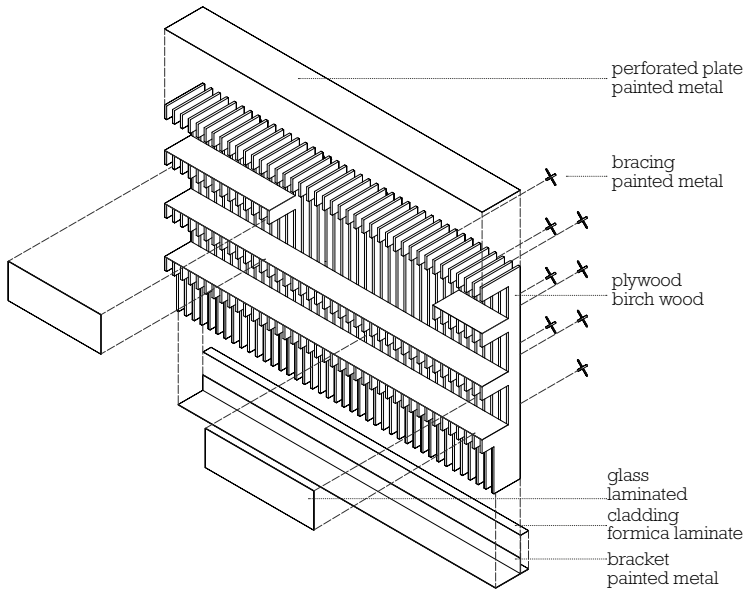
Construction detail - Main display element | Axonometric exploded view.
